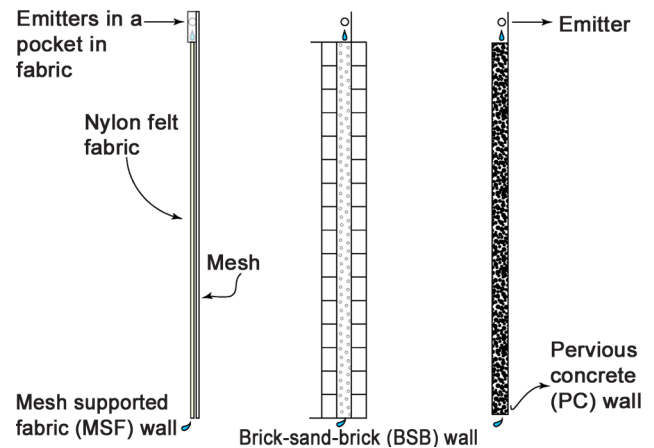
Novel wall designs of pervious concrete (PC) and mesh supported fabric (MSF) as compared with brick sand brick wall (BSB) design.
